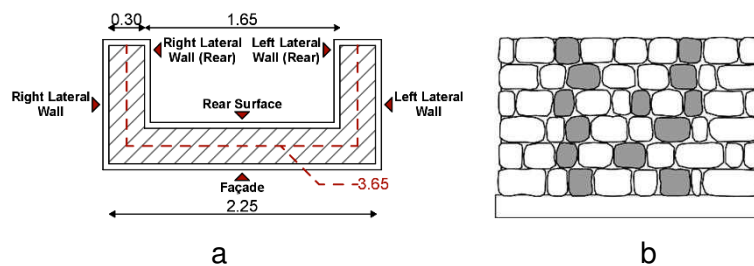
Plan configuration tested specimens (a); (b) front view regular stone masonry wall (REGW)
